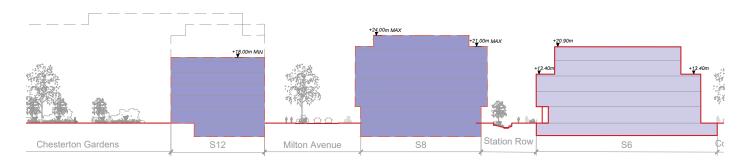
Parameter Section DD' - Building S8 east-west parameter section
